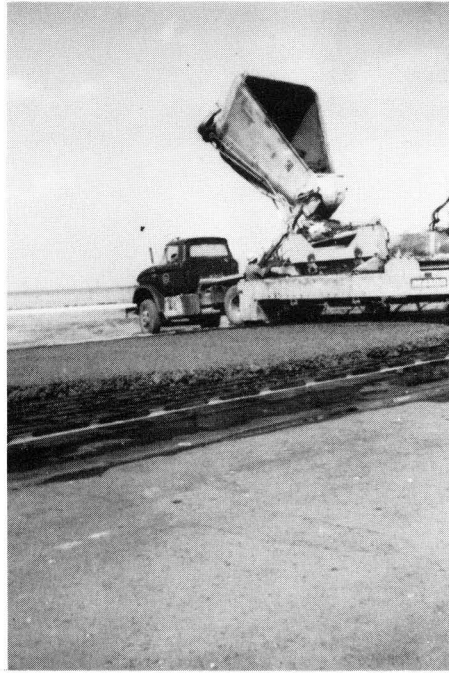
WET BATCH "AGITOR" TRUCK DUMPING CONCRETE INTO #1 SPREADER; "PANCAKE" OF CONCRETE SPREAD BY THIS EQUIPMENT IS SHOWN IN CENTER OF PHOTO.
